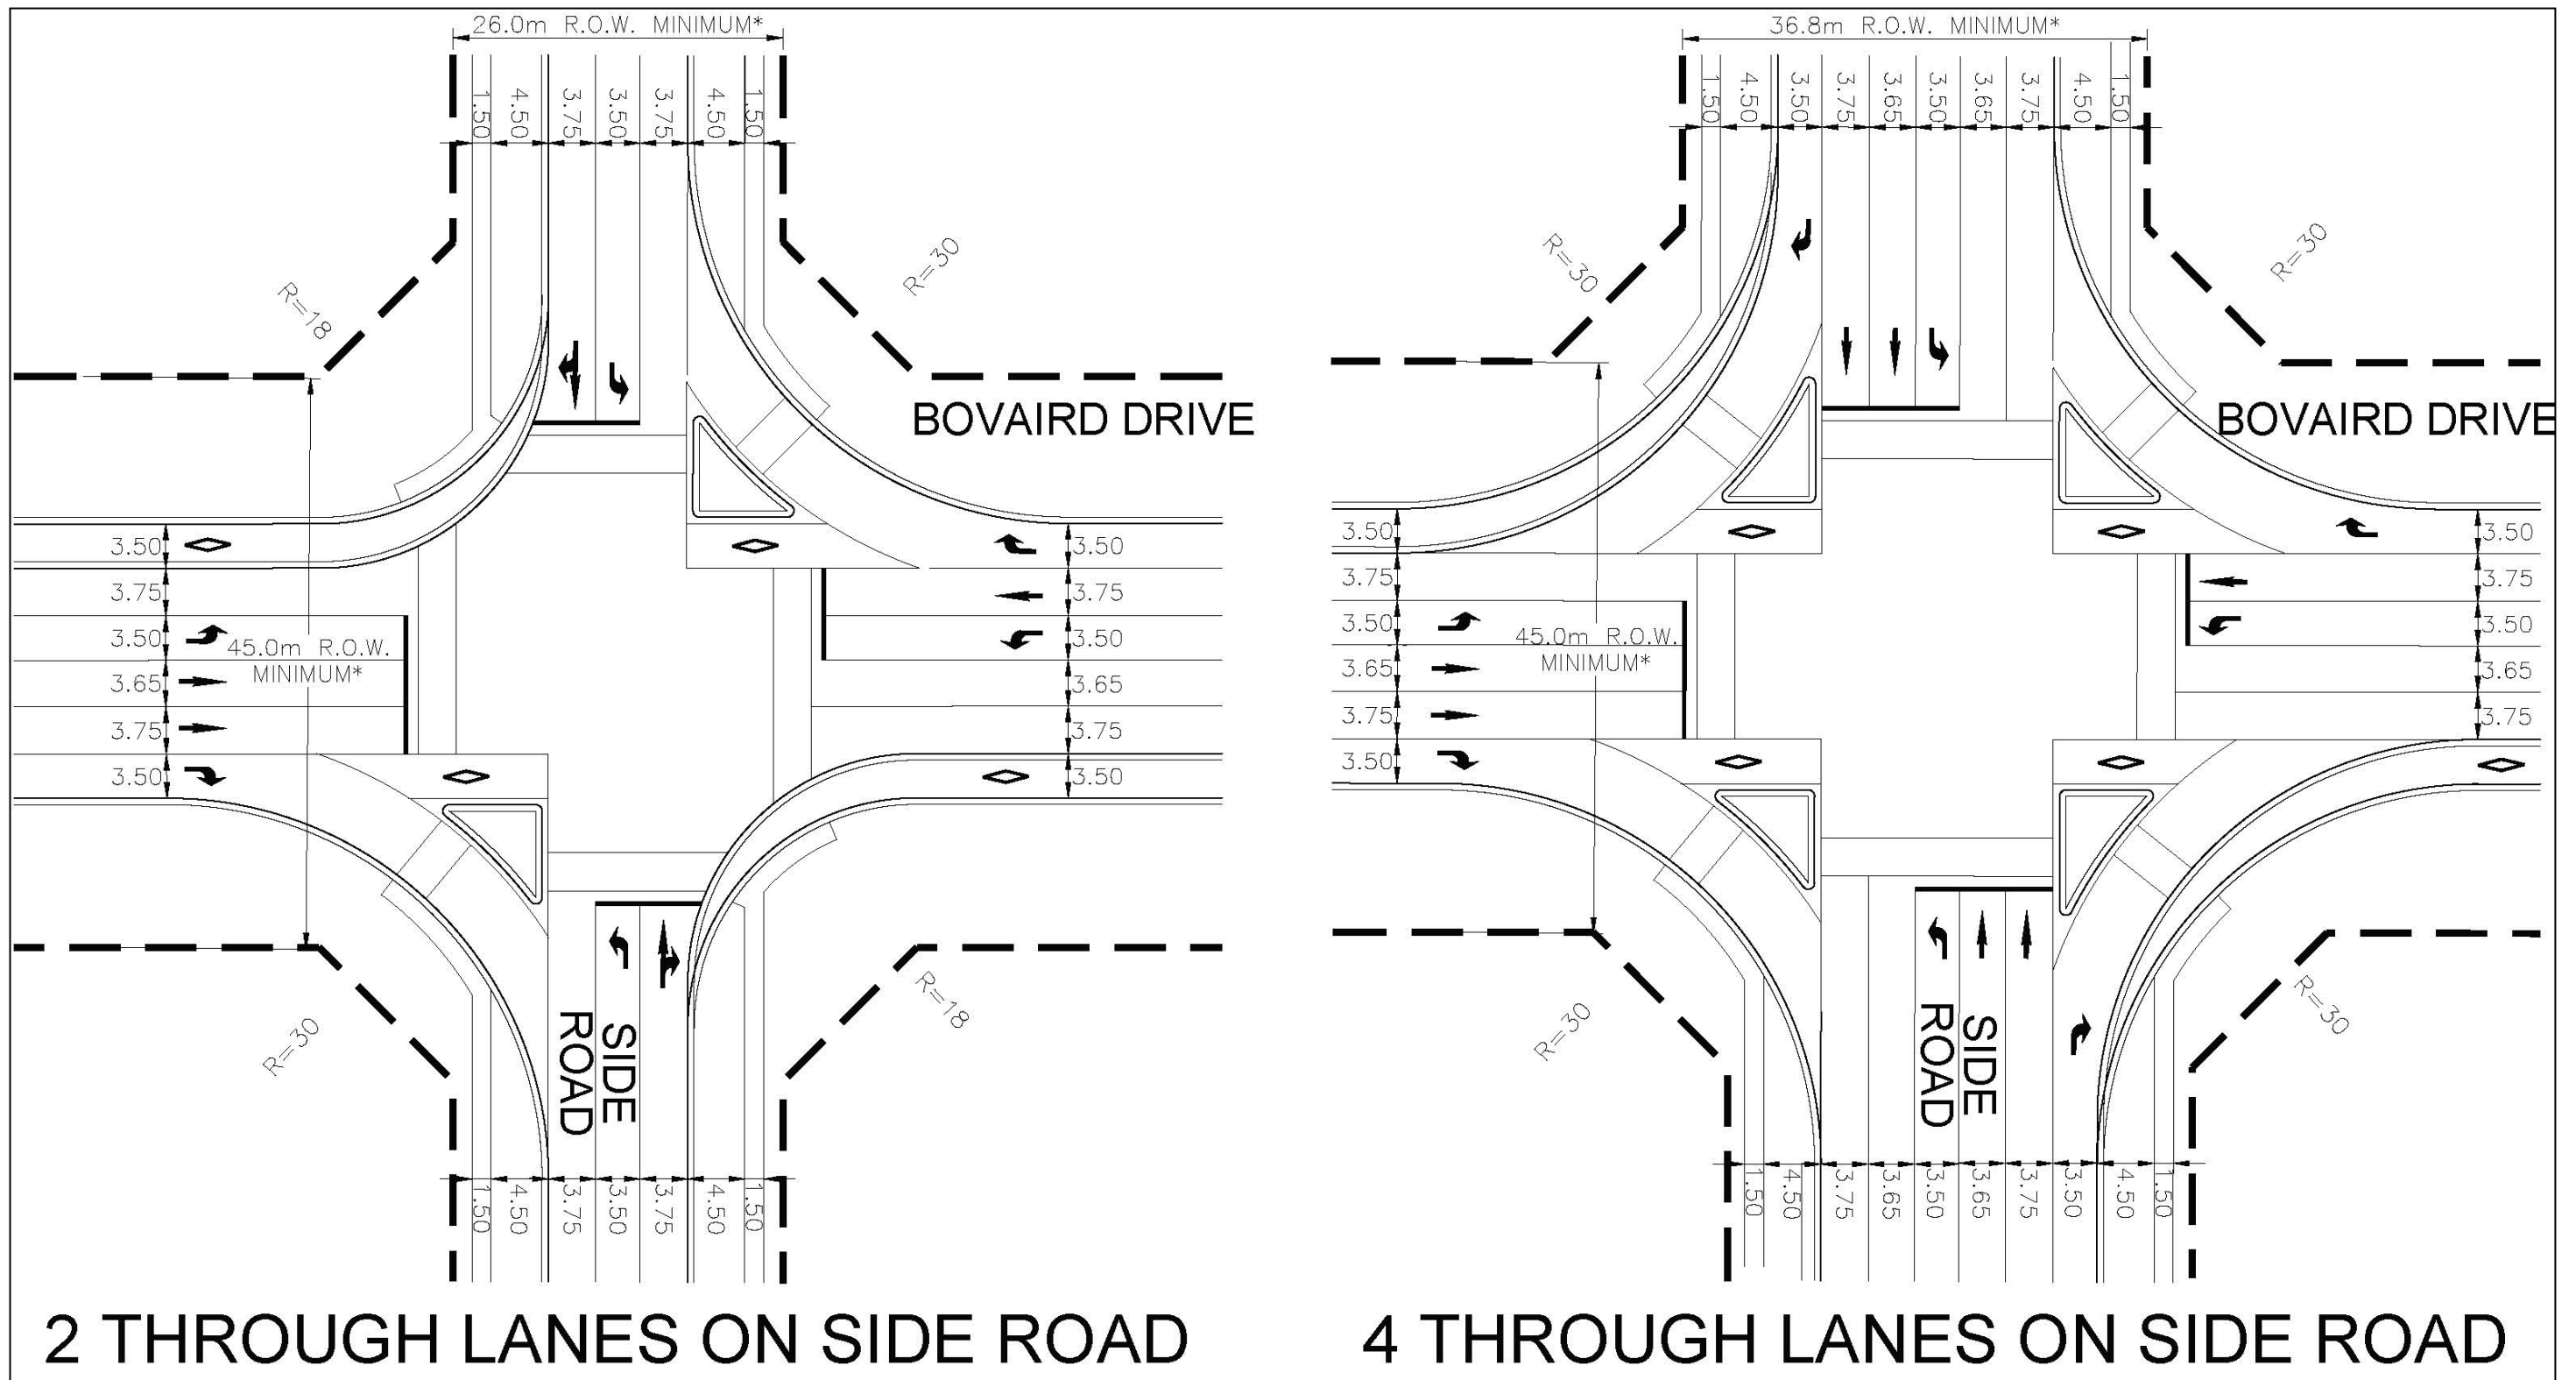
Potential Access Point Detail between Heritage Road and NSTC
